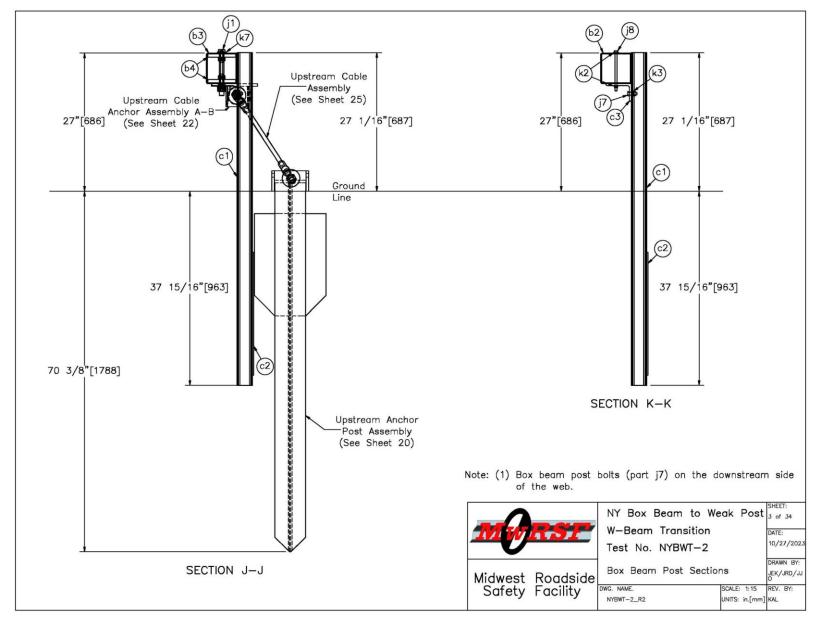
Box Beam Post Section, Test No. NYBWT-2
